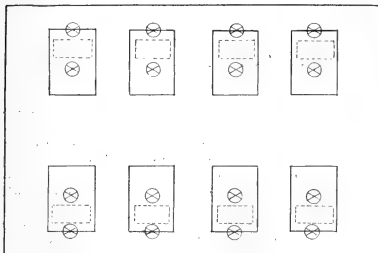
TYPICAL LAYOUT FOR SOLE-ROLLING MACHINES.
